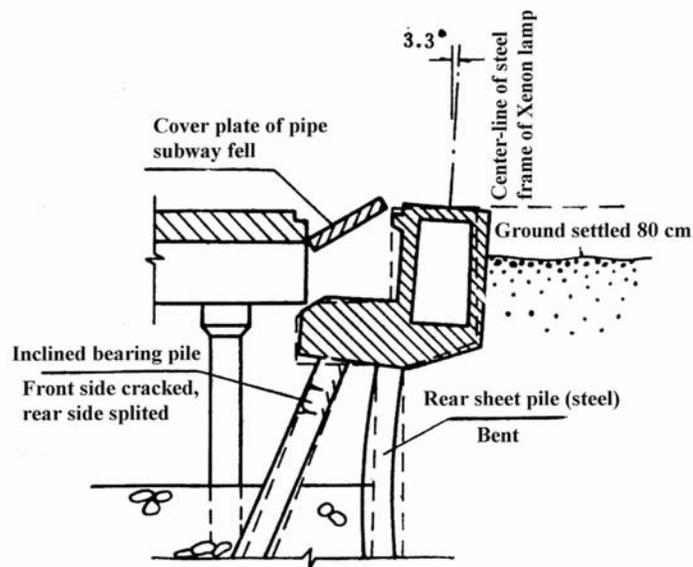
As sketch of a map showing damage to a retaining structure with rear sheet pile.
